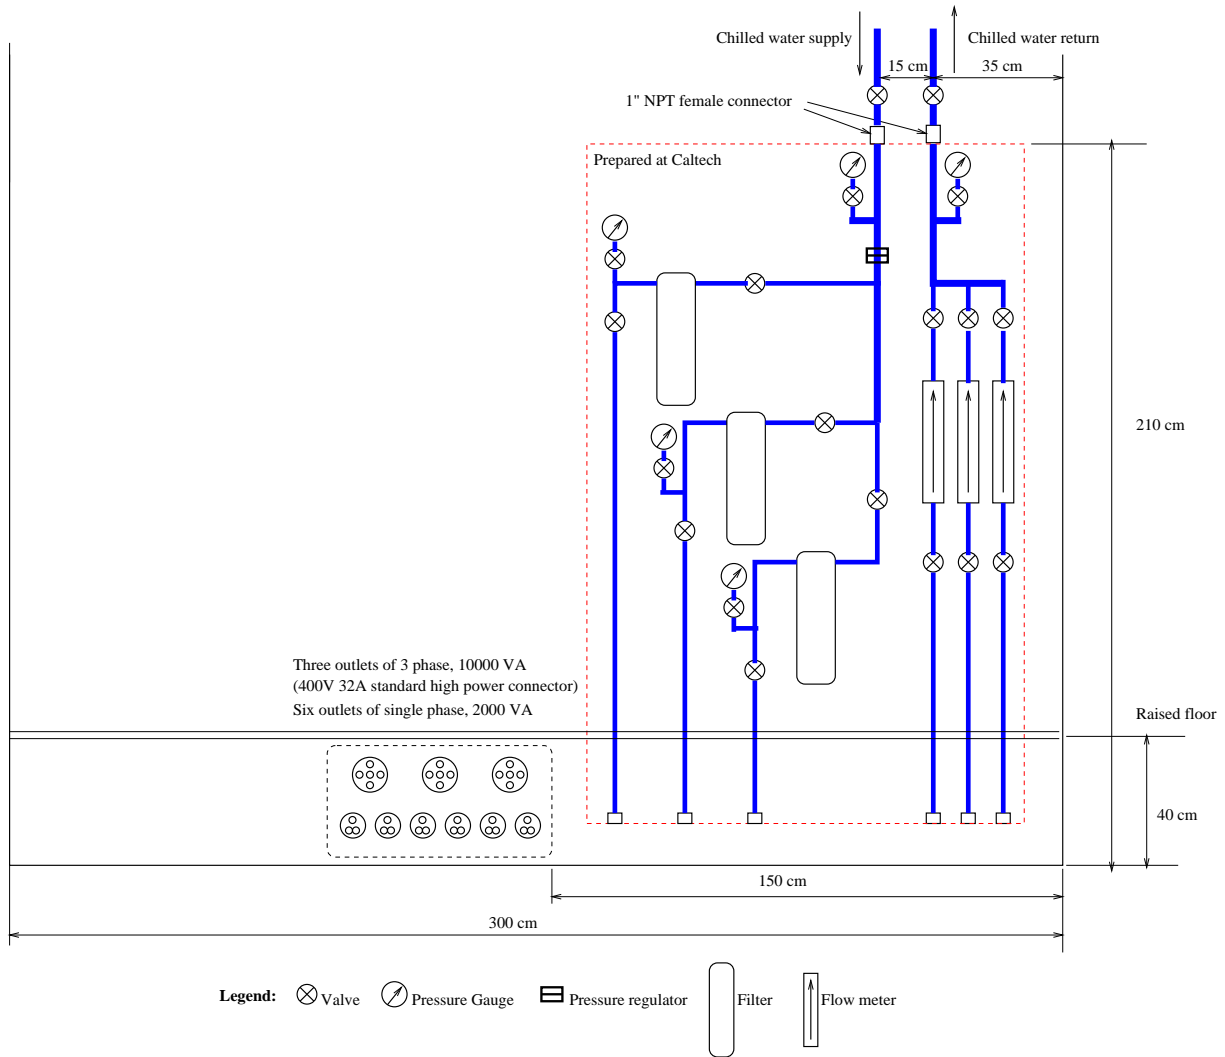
A schematic showing utility installation on wall in barracks at H4.
